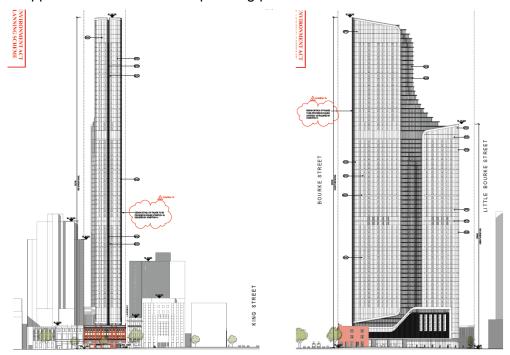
Endorsed south (left) and east (right) elevations under Ministerial planning permit 201535721-1 at 640-652 Bourke Street, Melbourne
